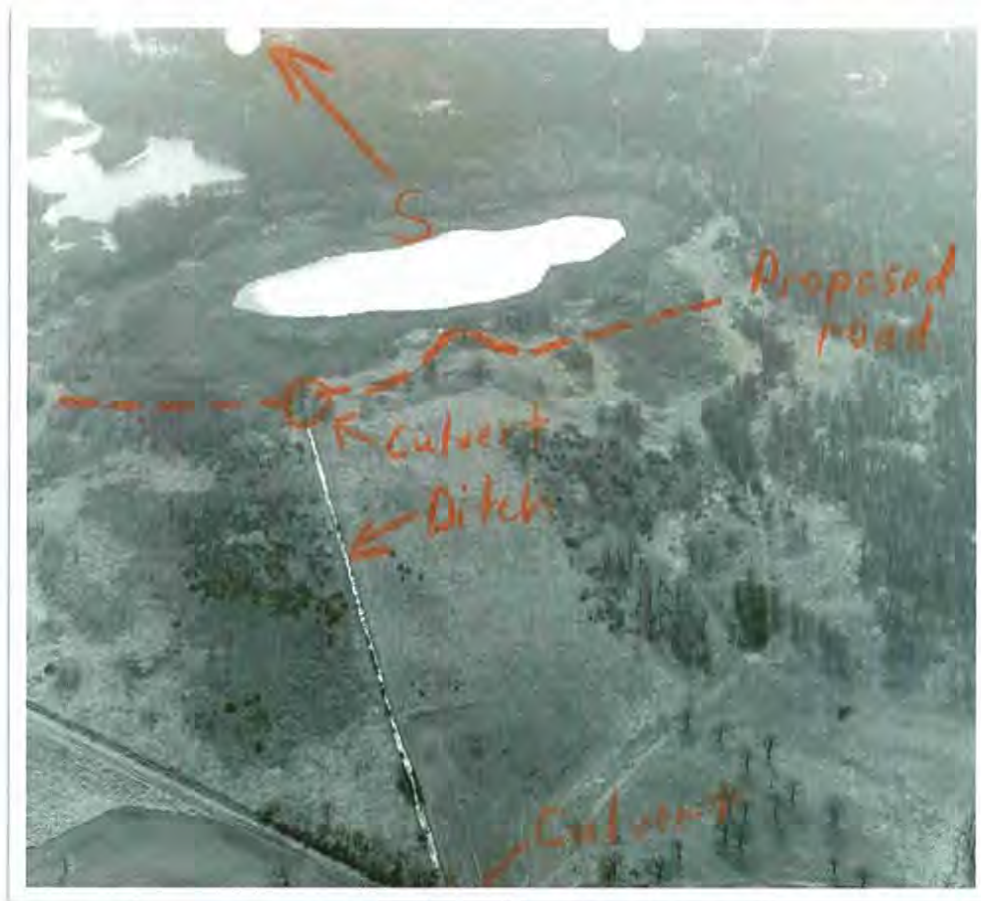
Aerial image with labels of Black Lake and vicinity. Note the south (S) directional arrow. The image (with the labels) was included in the 1987 permit application. The DNR advised that a permit was not needed for the proposed road because it was located north of Black Lake. The Black Lake outlet is the culvert under the proposed road as noted with a circle where the proposed road intersects the culvert. The water outlets to the north via a ditch. The culvert labeled at the north end of the ditch (bottom of image) did not require a DNR permit because the wetland north of the farm road is not a public water.
